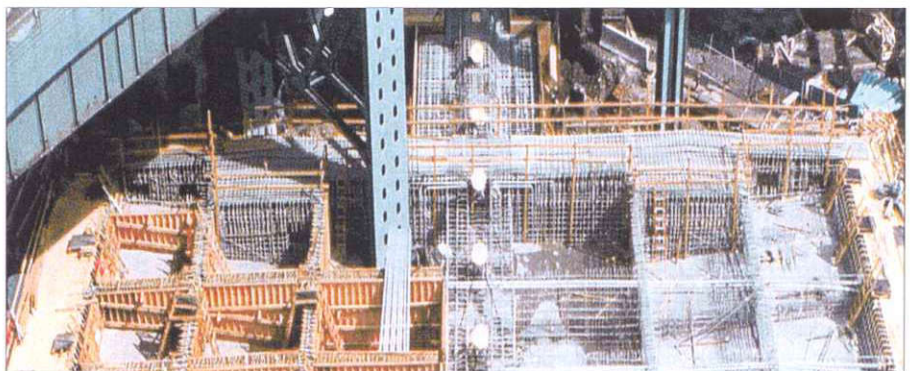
South end of south back span during cast-in-place construction of cellular box girders. The last three back span cables were anchored to a spline extension (shown) as the bridge superstructure was terminated prematurely to avoid conflict with a CA/T ramp tunnel (not shown).
